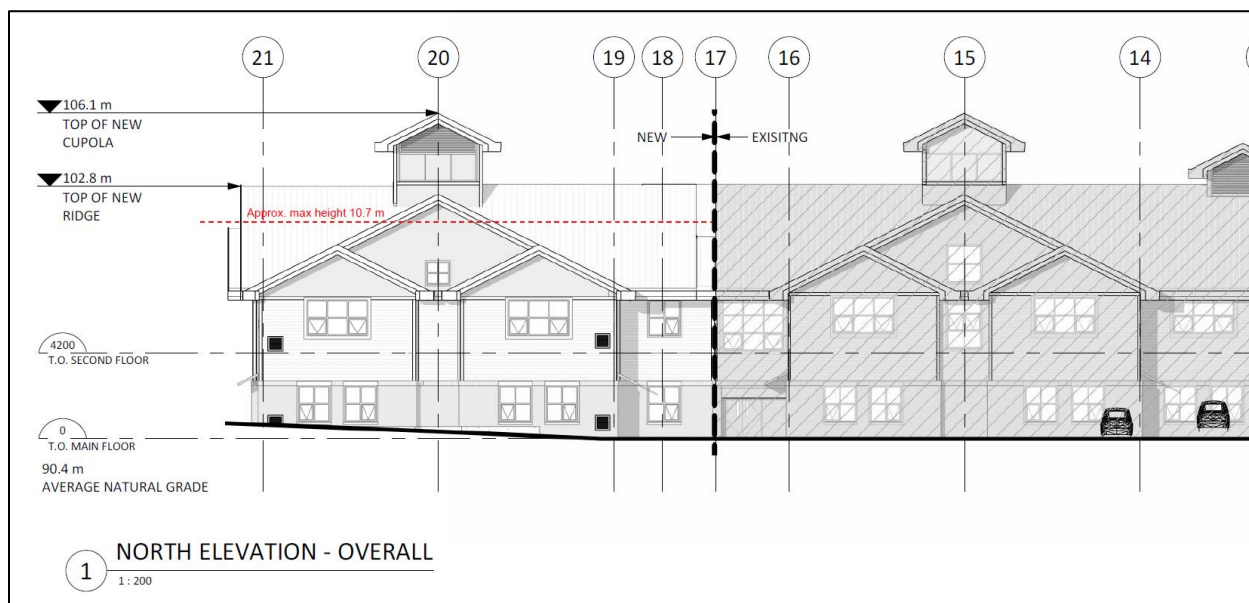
North Elevation – Illustration of Cupola and Top of Ridge relative to Existing School
